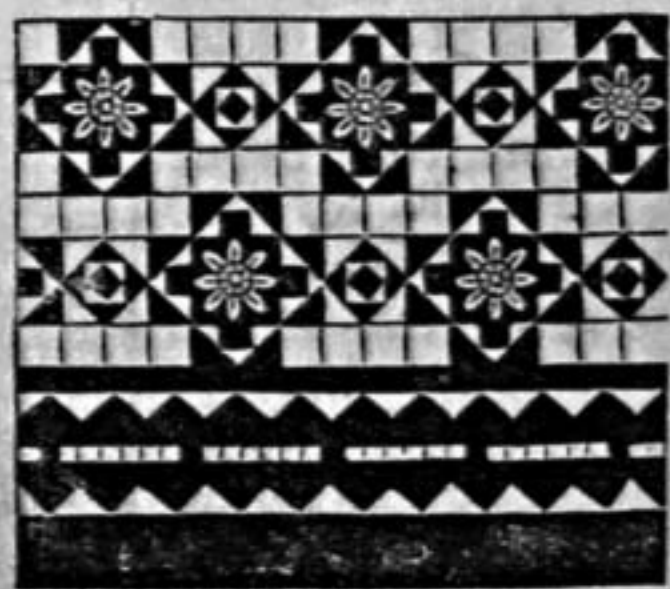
Moulded Bricks for Cornice or Upper Stringing.
